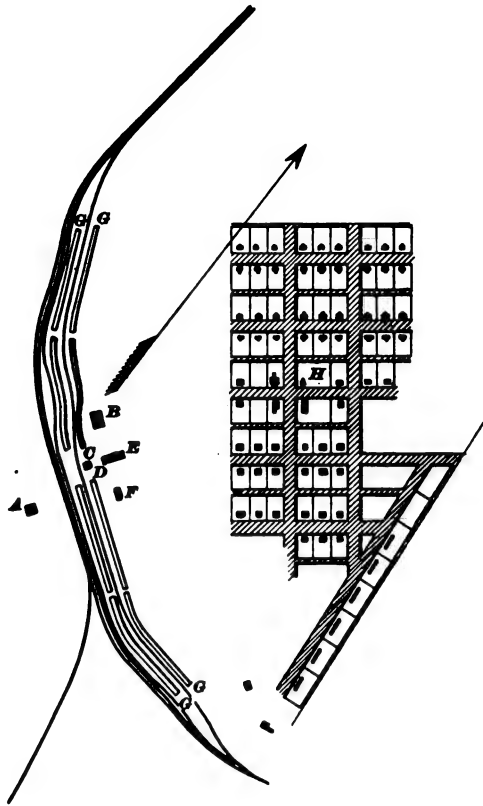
PLAN OF LEISENRING NO. 3 COKE PLANT.
